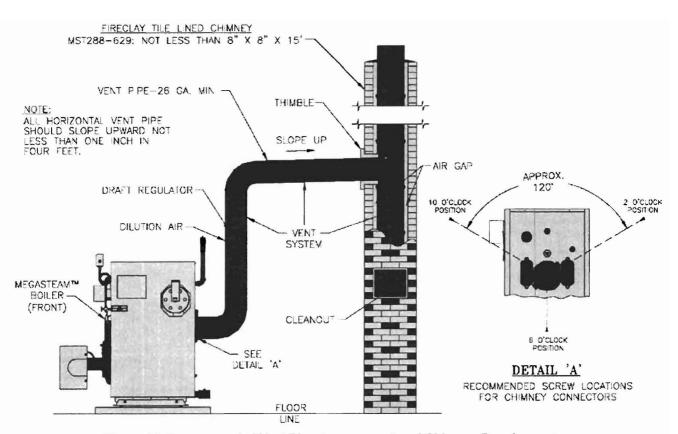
Recommended Vent Pipe Arrangement and Chimney Requirements
